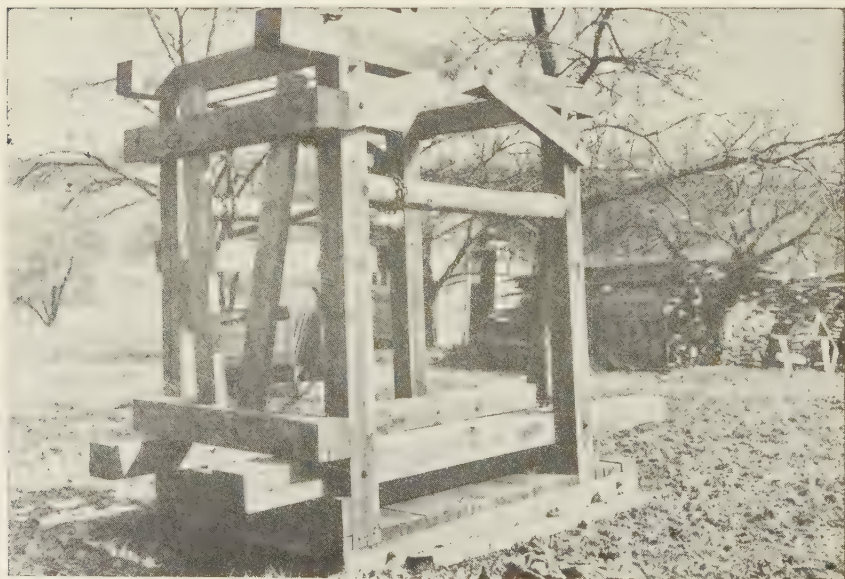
Detail of cattle stocks, giving dimensions and plan of construction.
